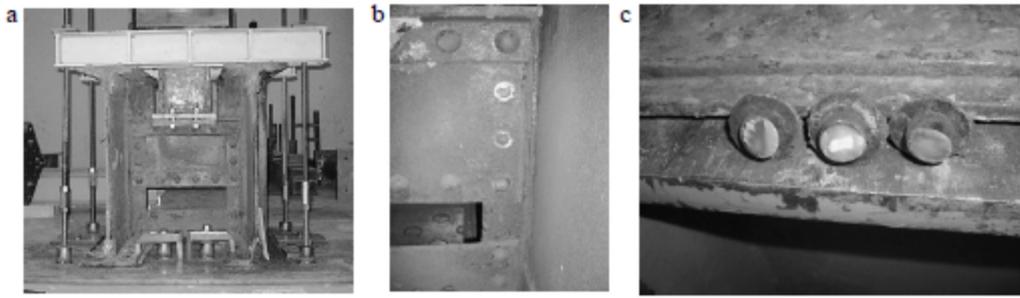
Monotonic shear test on a short diaphragm riveted connection: (a) test setup; (b) loosening rivet on the diaphragm connection; (c) failed rivets.
